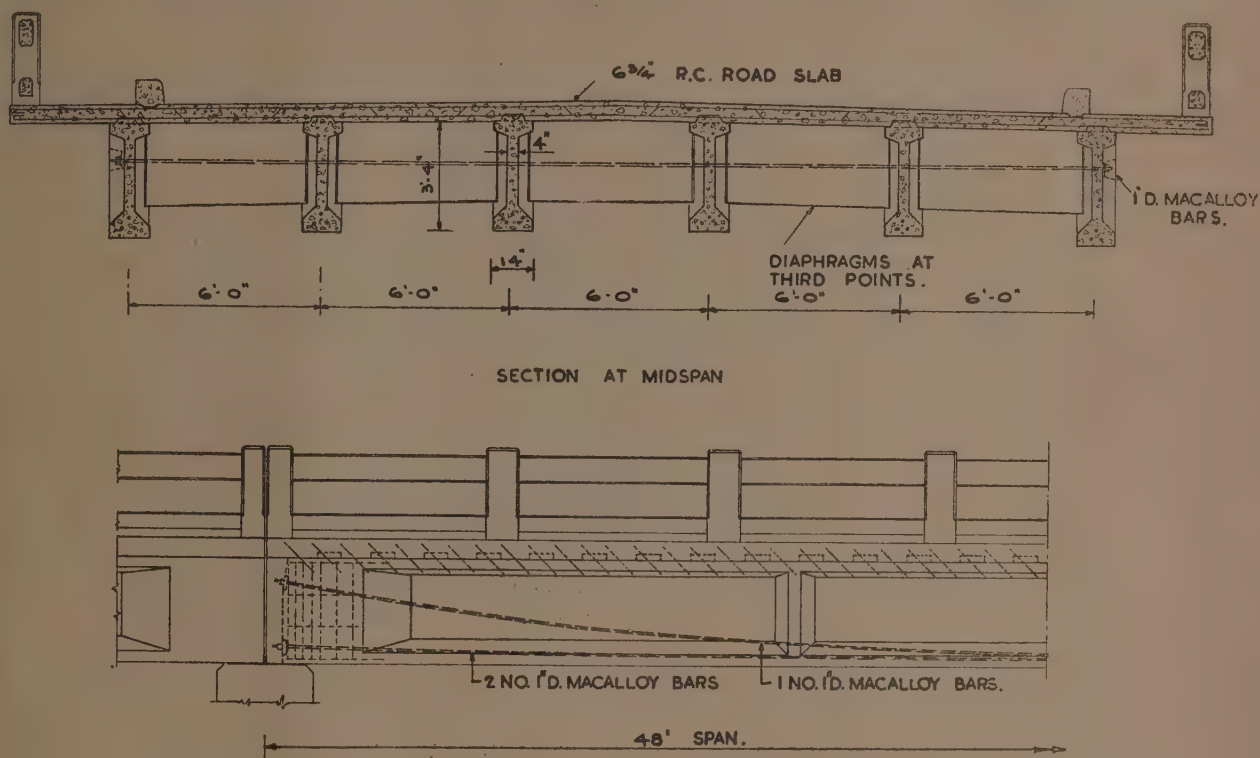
Lower Tampa Bay Bridge, Florida—details of prestressed construction
